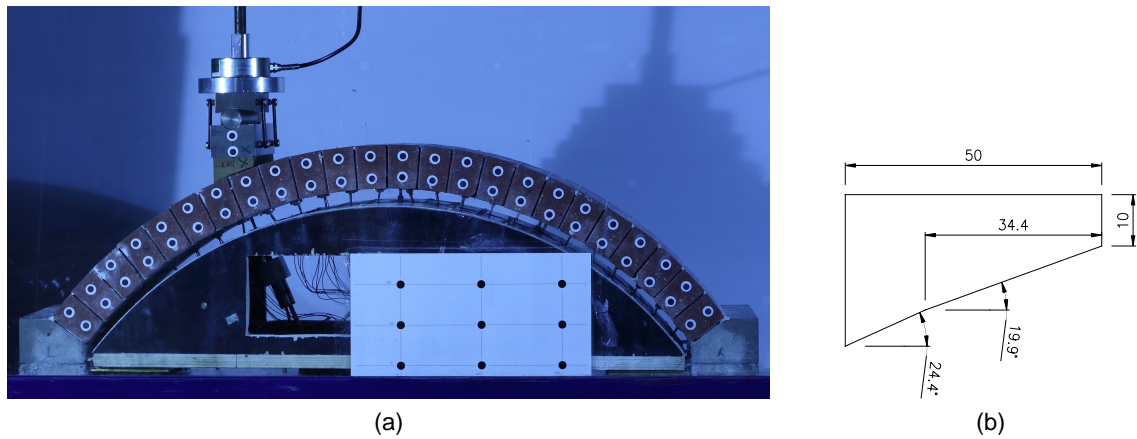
Bare arch tests: (a) test setup; (b) wooden saddle
